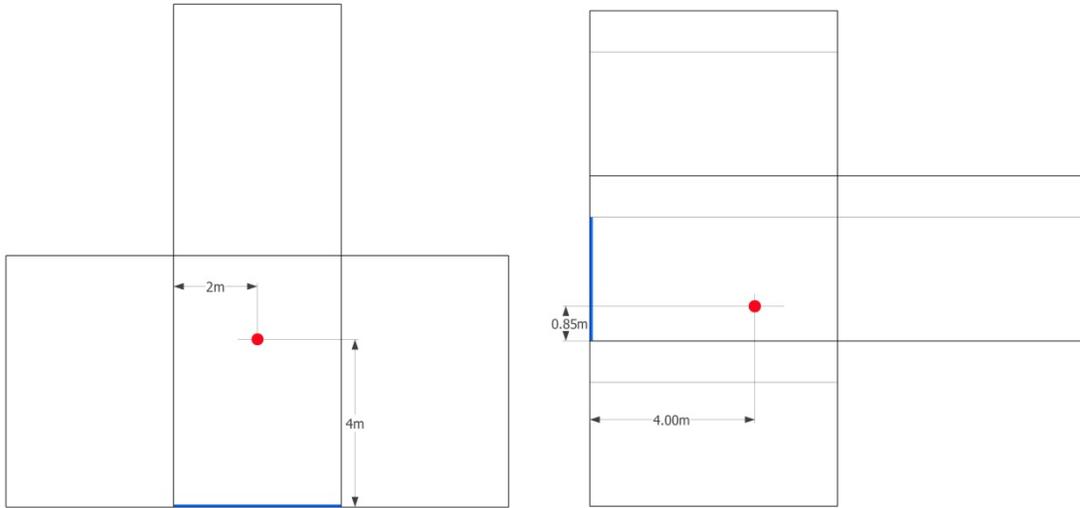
Plan (left) and side elevation (right) of lighting sensor at 4m from window
